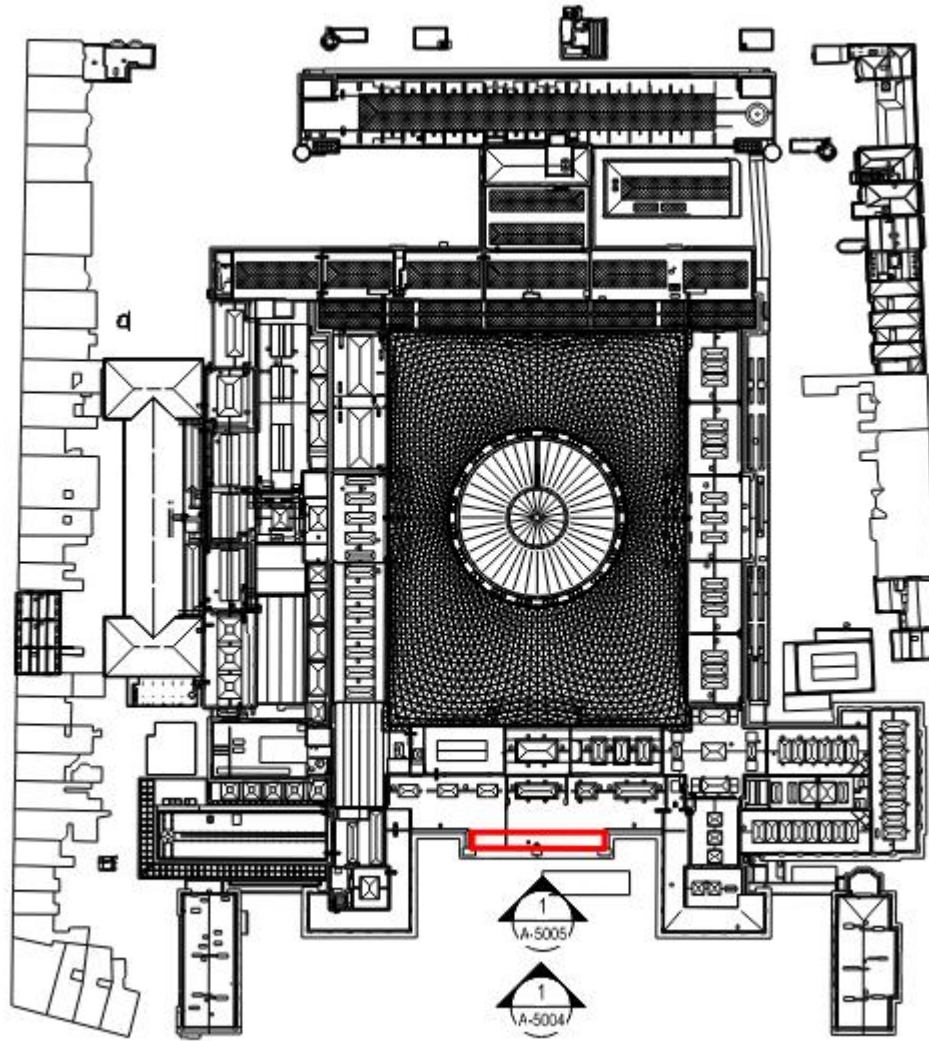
BRITISH MUSEUM; SOUTH COLONNADE SITE LOCATION PLAN
